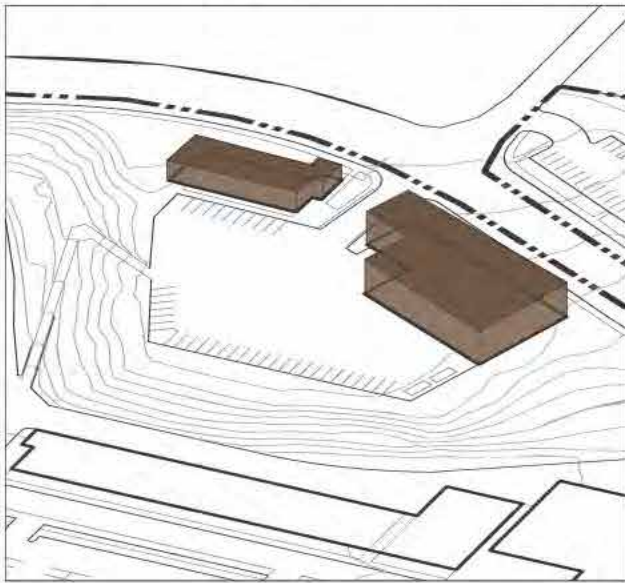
Axonometric and Site Plan of new M&O buildings
